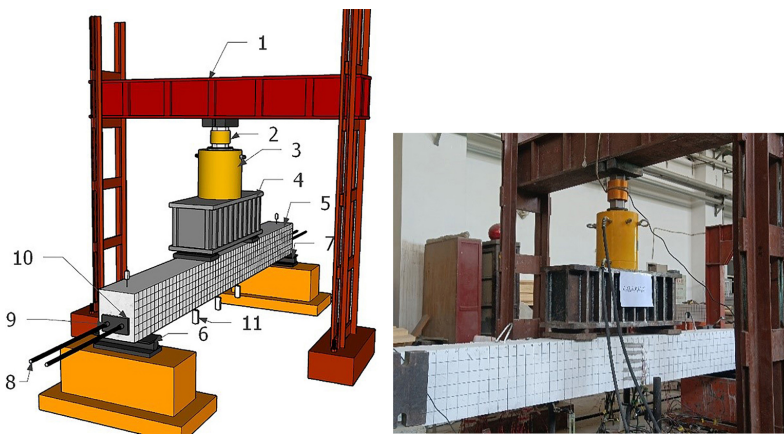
Test setup and instrumentation: 1 – counterweight frame, 2 – pressure sensor, 3 – jack, 4 – distribution beam, 5 – specimen, 6 – fixed hinge support, 7 – sliding hinge support, 8 – steel strands, 9 – anchorage, 10 – steel plate, 11 – displacement meter
